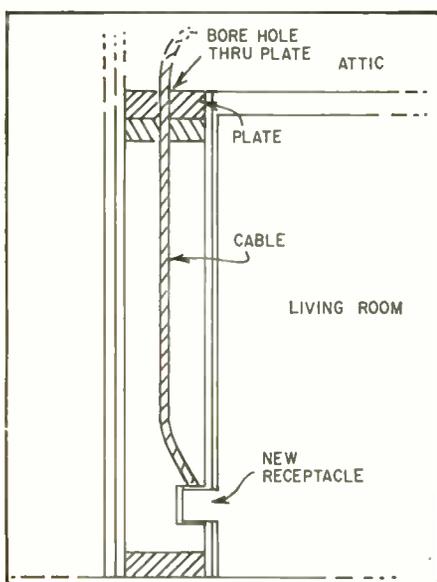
Another way of running lead-in to a wall box is down through the attic.
